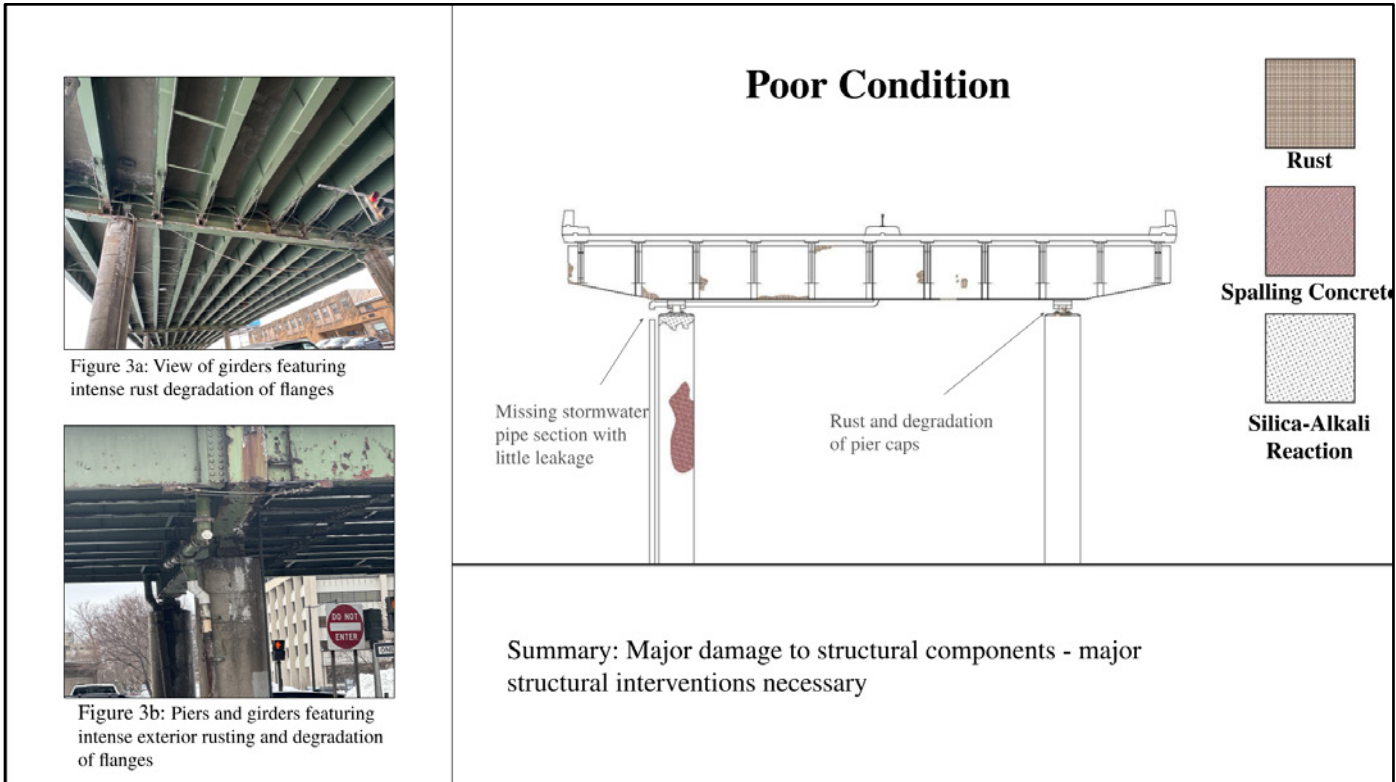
Typical section guide for visual inspection of poor condition
